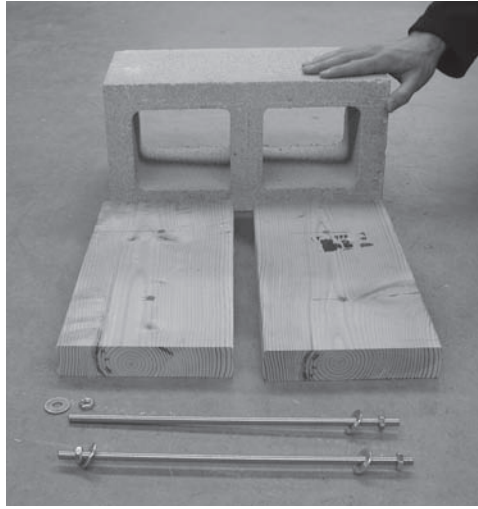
Concrete block; two boards, cut to size; bolts; nuts; and washers; not shown: bentonite, gravel, and pan of water
